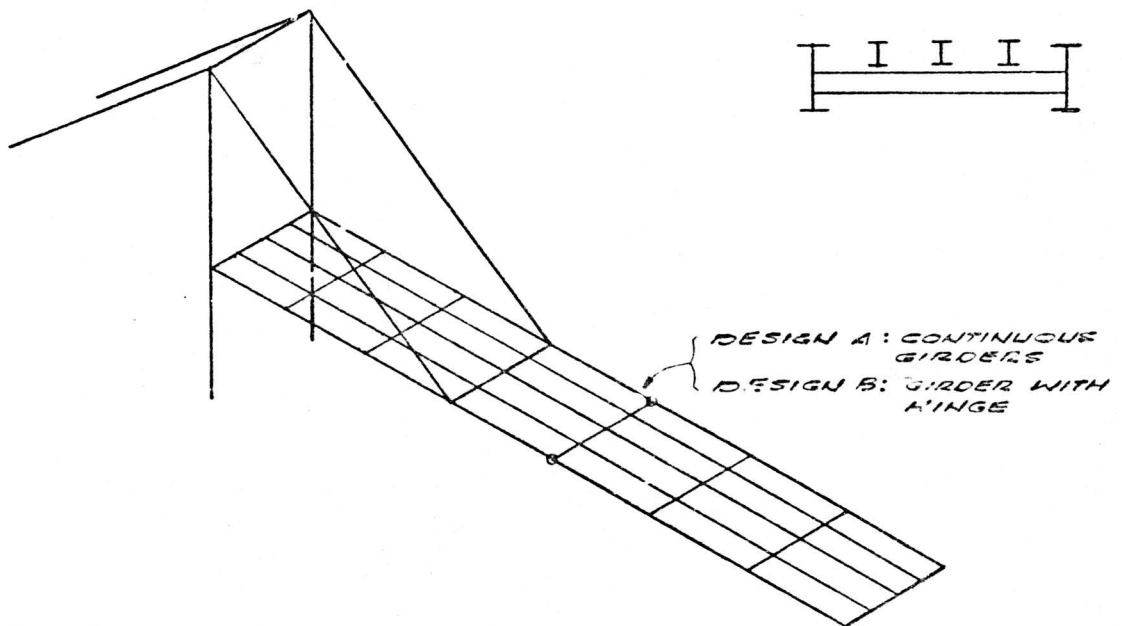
ISOMETRIC SCHEMATIC DRAWING OF BRIDLE BRIDGE CONCEPT IN NEW BRIDGE APPLICATION
